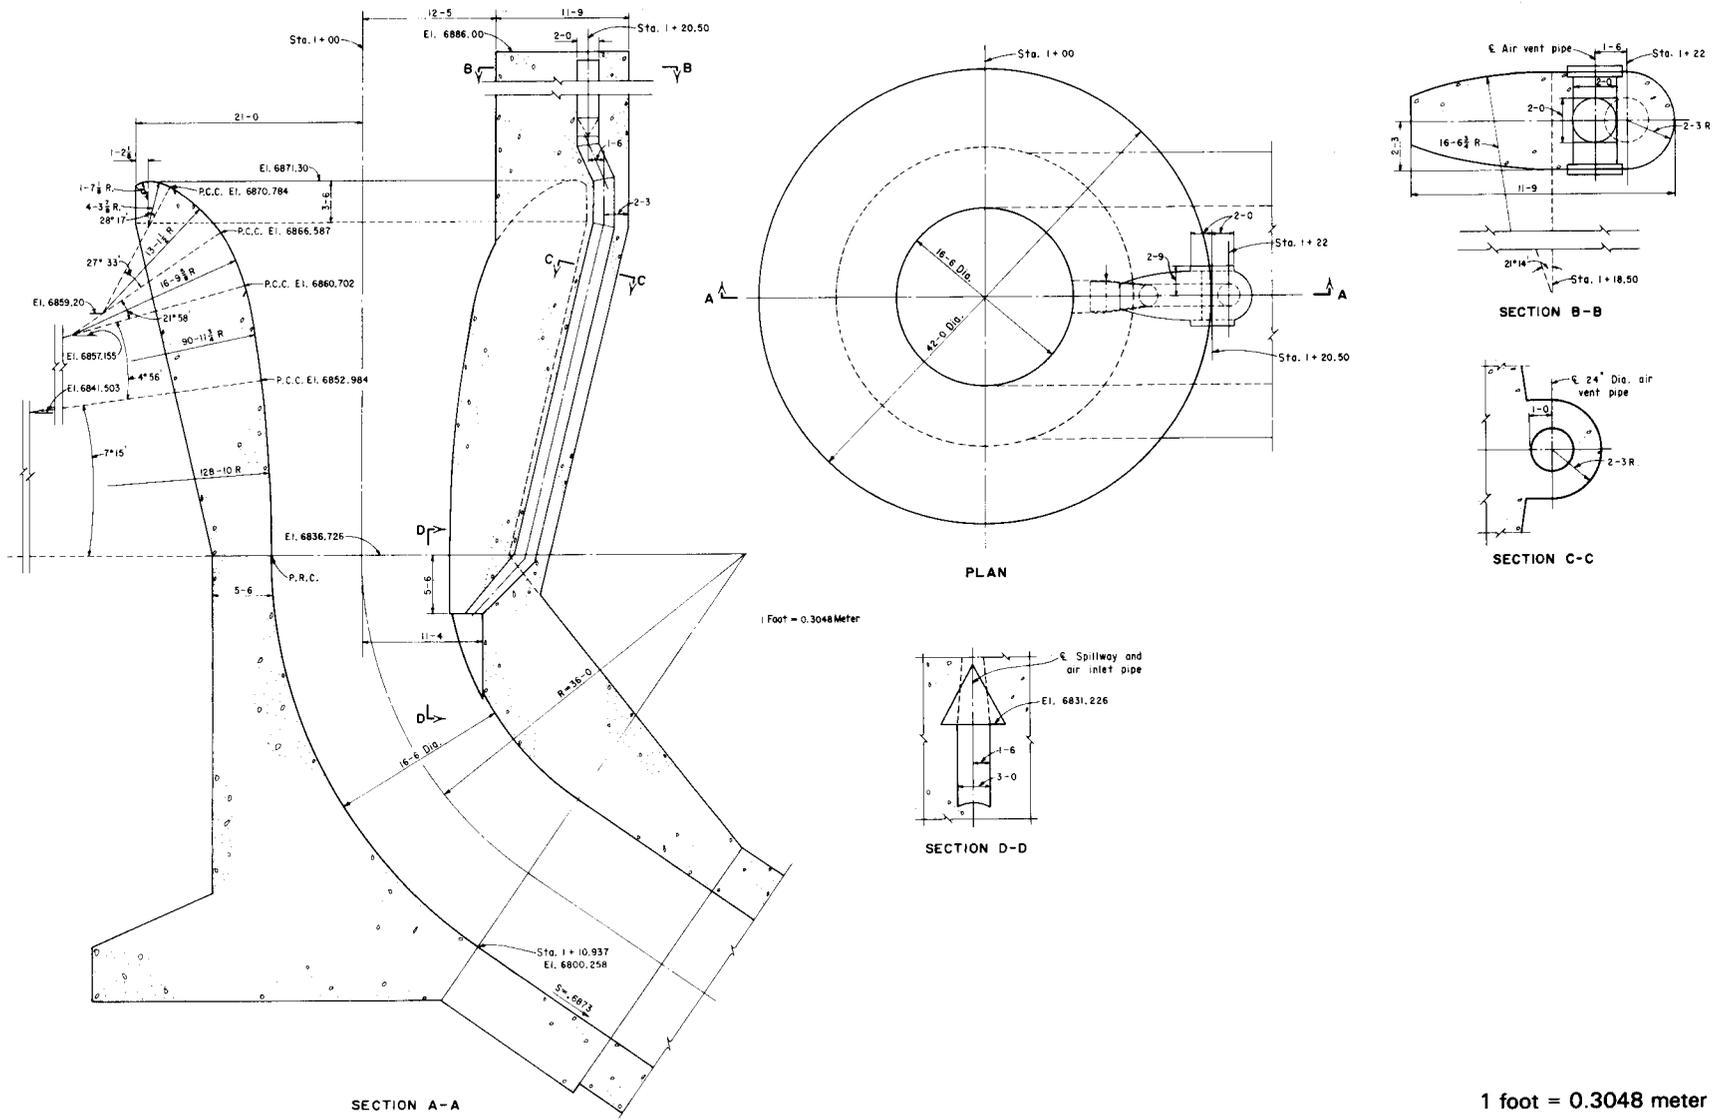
Plan, profile, and sections – preliminary crest and pier design.
